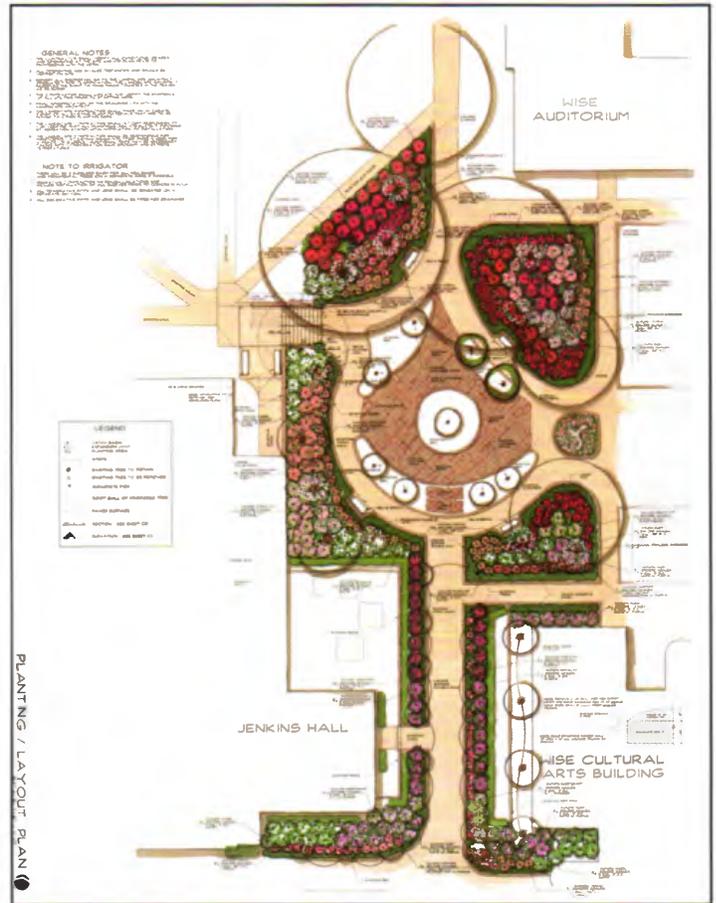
Brundrett Azalea Garden color plan drawing by Burnett and Partners, Inc. (Figures 1 and 2 used by permission.)
